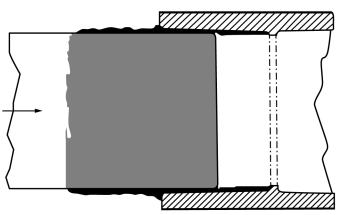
Assembly of Surfaces While They Are Components must be Assembled while all Surfaces are Wet and Soft
